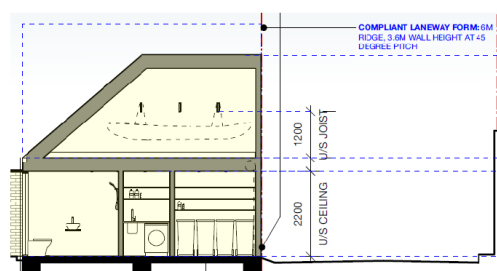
Section A- showing reduced bulk and scale of the proposed outbuilding with a gabled front and hipped rear roof form
